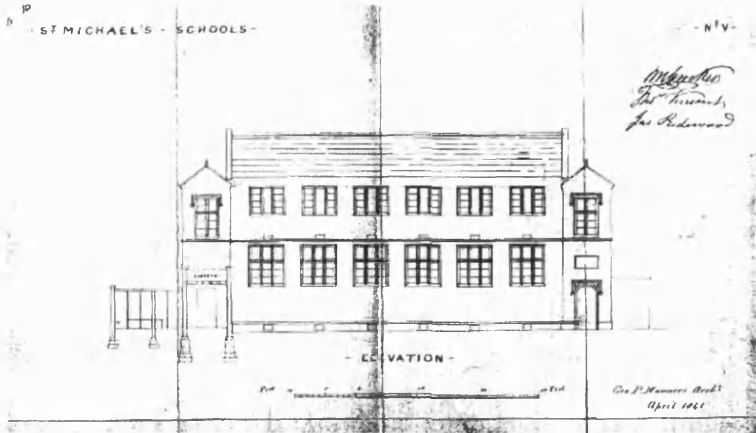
(above left) St. Michael's Schools, Walcot: the original elevation of two storeys. G.P. Manners, April 1841.
